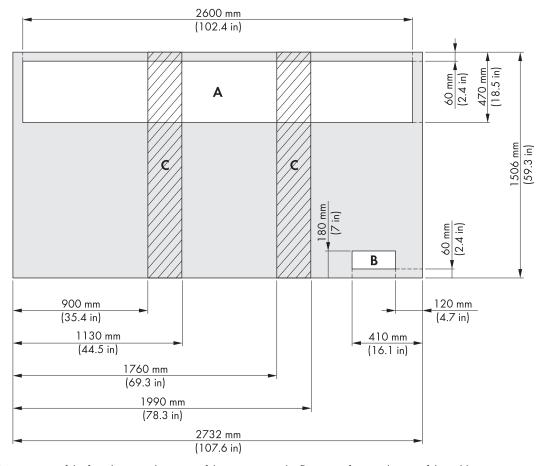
Minimum size of the foundation and position of the openings in the floor area for introduction of the cables
